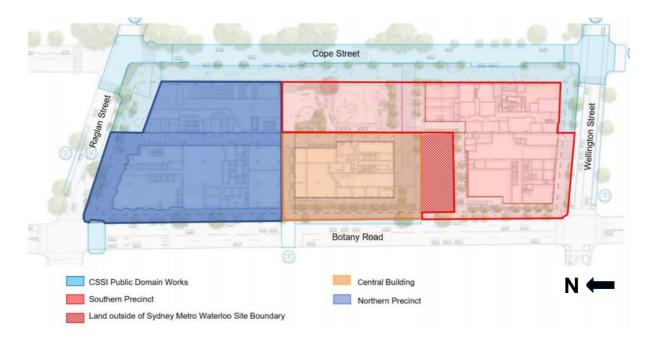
| Site plan of the Central Precinct (shaded orange). (Source: Applicant's EIS)
